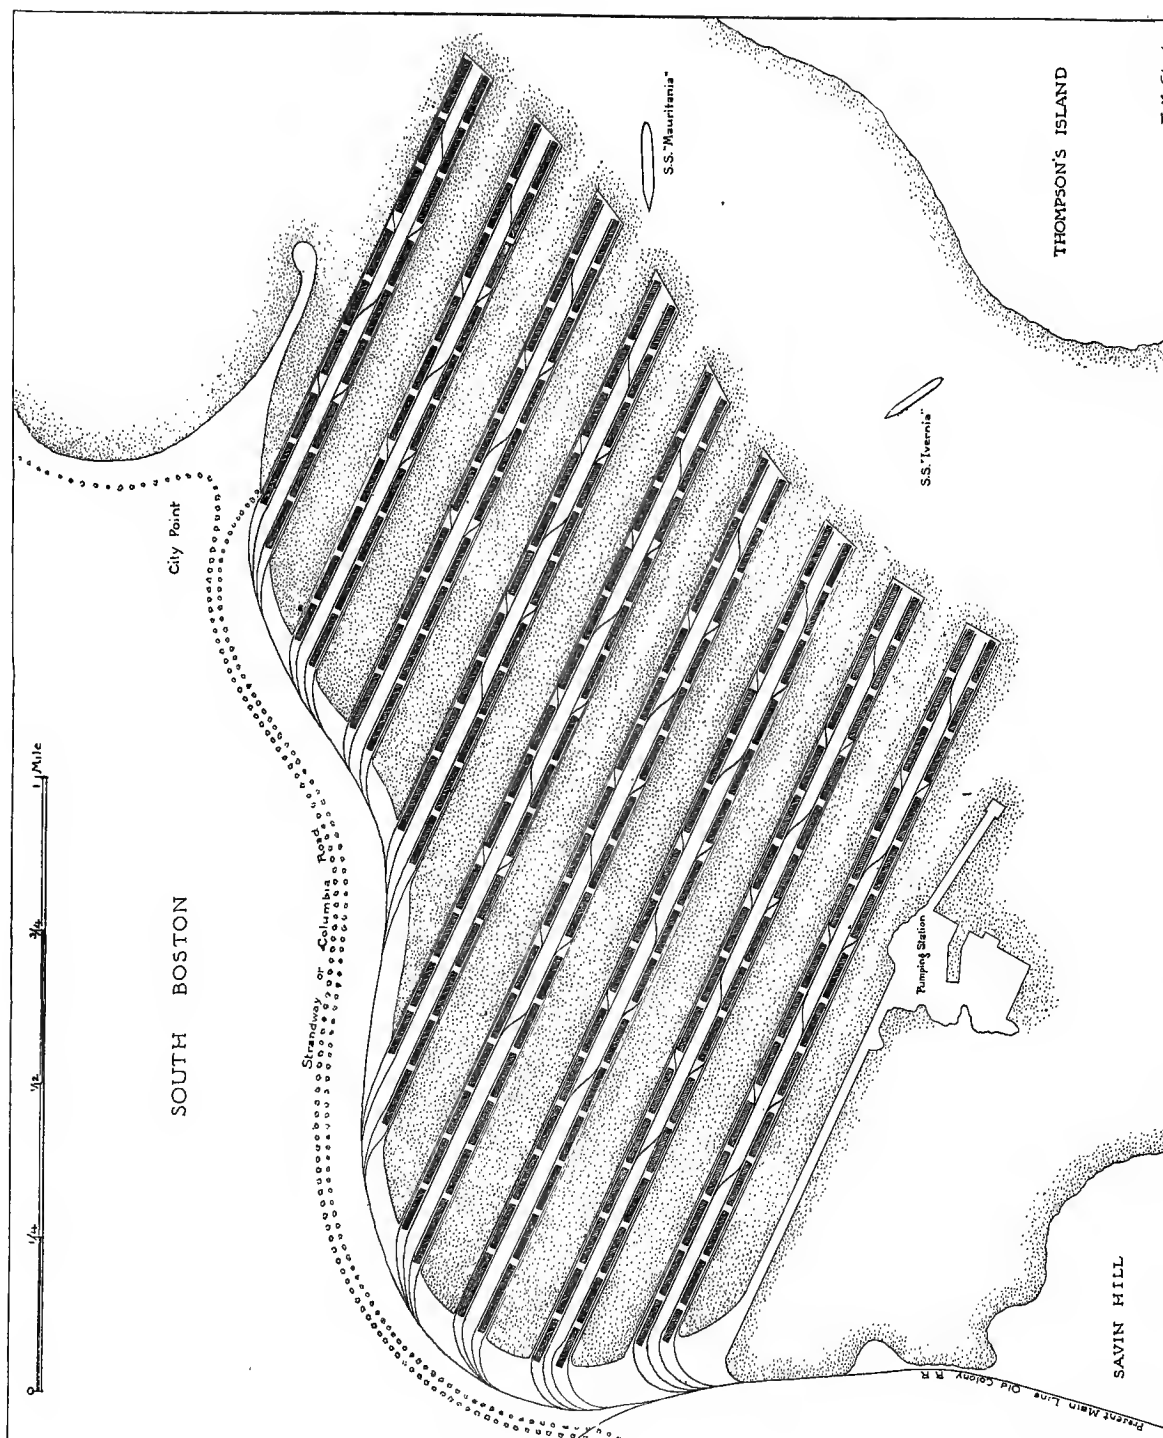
Plan of Proposed New Docks, Showing Railways and Warehouses.
